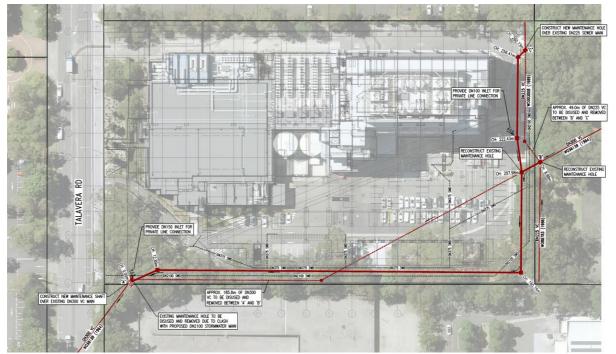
Sewer Layout Plan (Source: Sydney Water, 2022)
